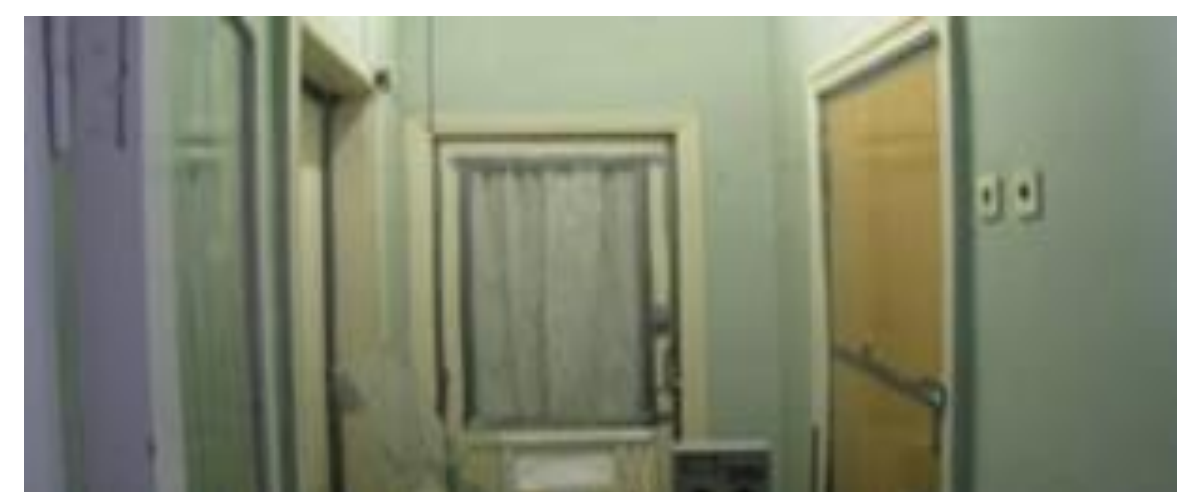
Old "airlock area "with wooden doors and cracked walls.
